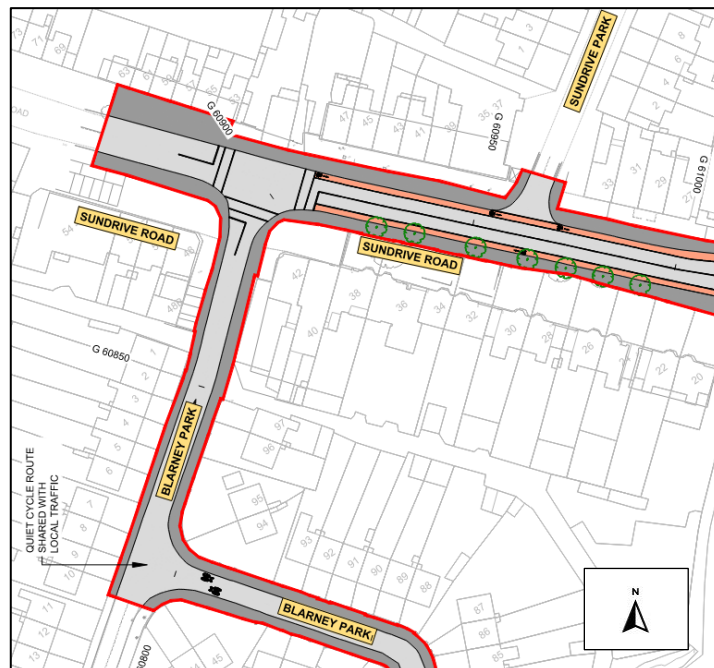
Poddle Cycleway at Blarney Park & Sundrive Road
